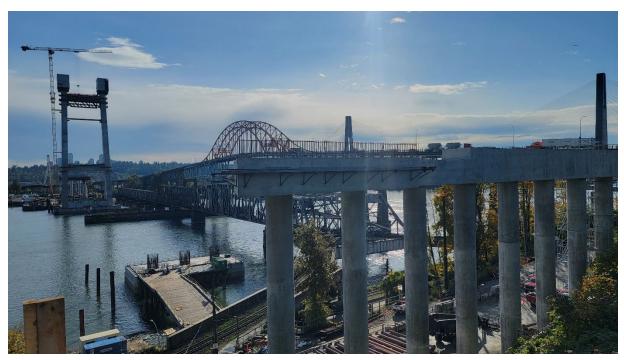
Pier N2 In New Westminster And The Two In-River Piers N2 And S1
